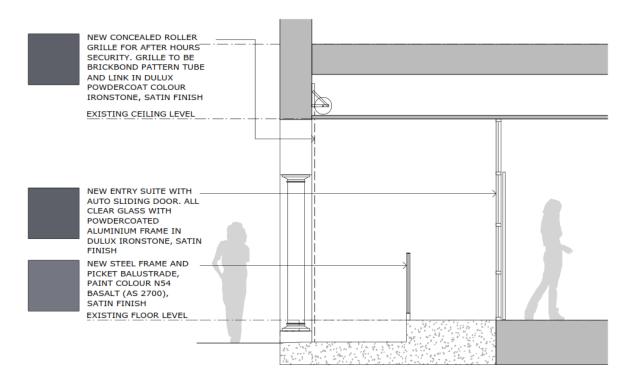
Section Drawing, Lower Ground Floor Entry (Building Assets Planning Design and Delivery Northern Beaches Council).
